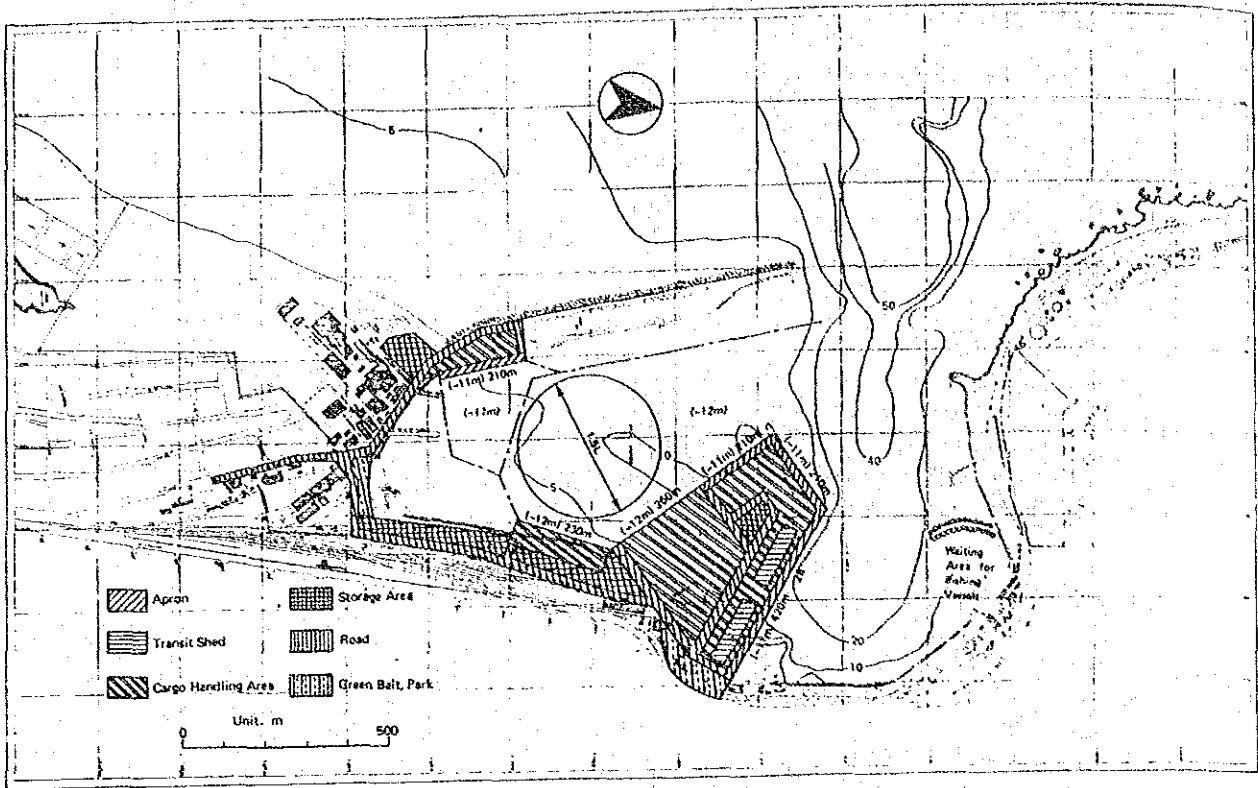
Master Plan of San Antonio Port (2010) Plan A
